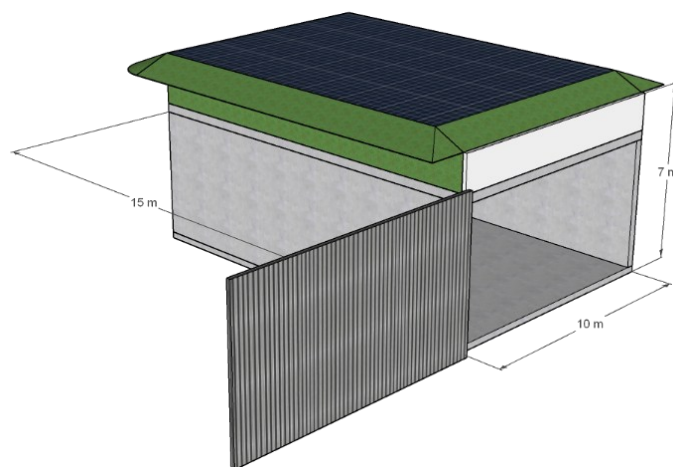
Impression of the underground storage with sunken-street access. Dimensions are indicative.
